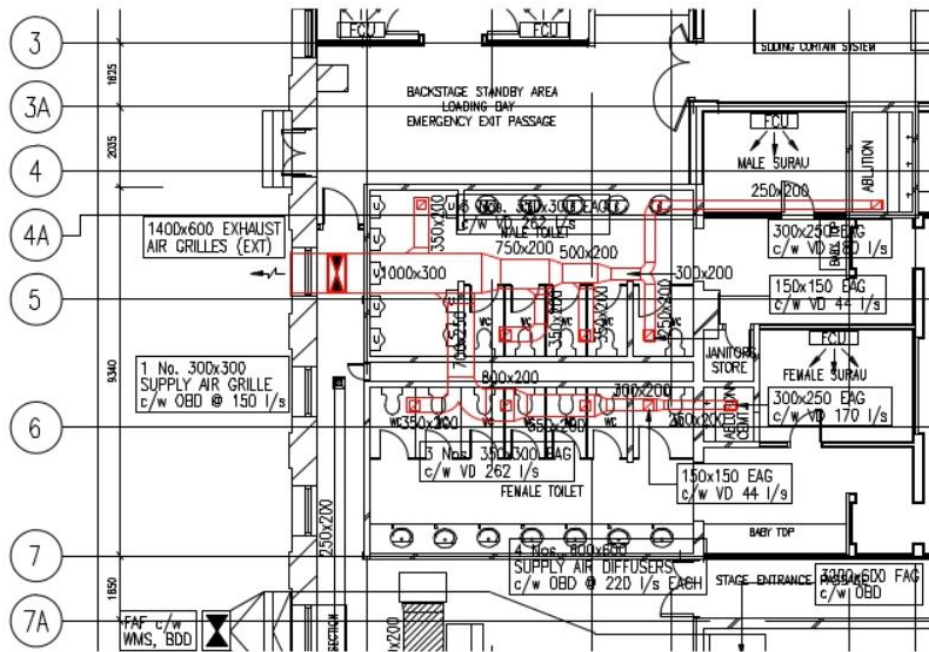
Plan drawing of exhaust air grille used in the public toilet of KLPac
